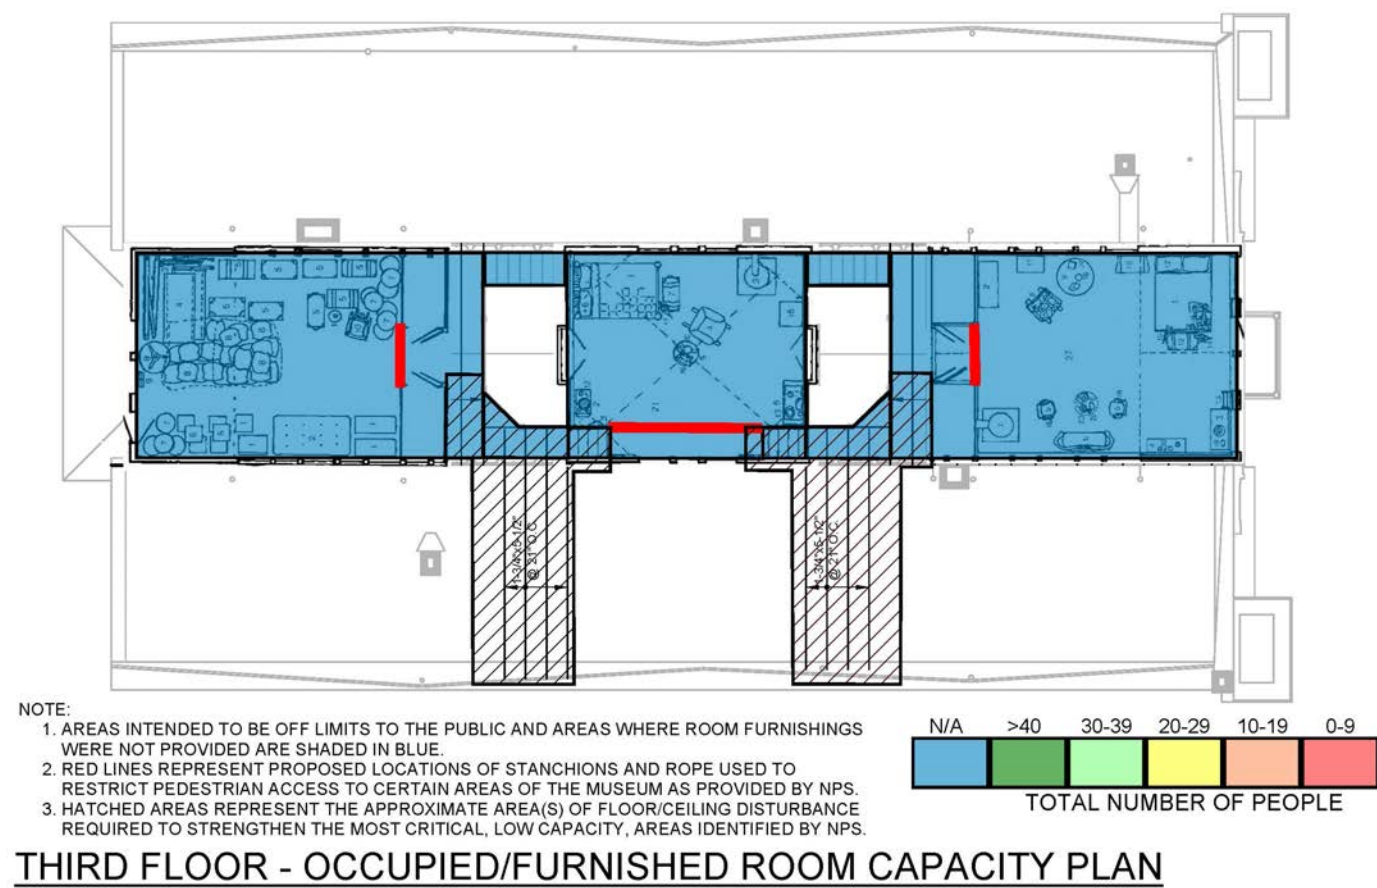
Furnished Room Capacity Plan - Third Floor
